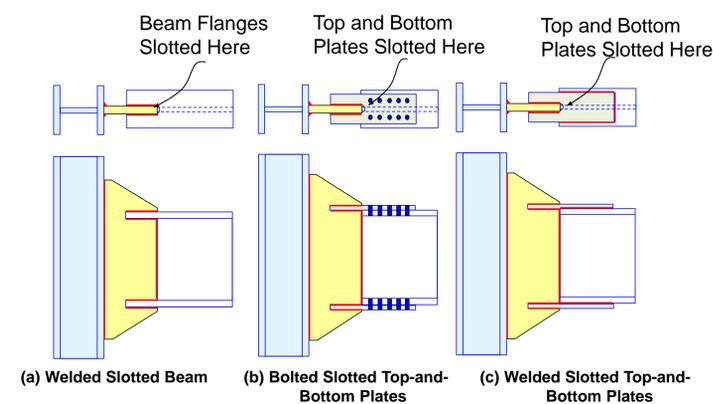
Other Feasible Details for the Proposed Gusset Plate Moment Connection
